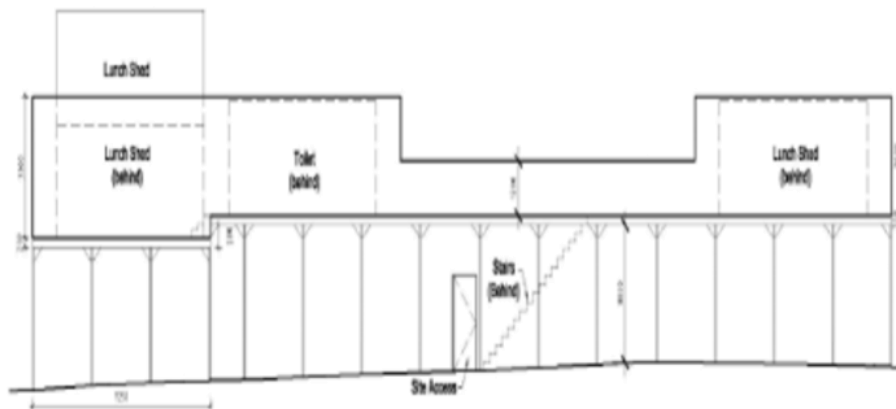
Typical Elevation for Type B Hoarding with Site Sheds
